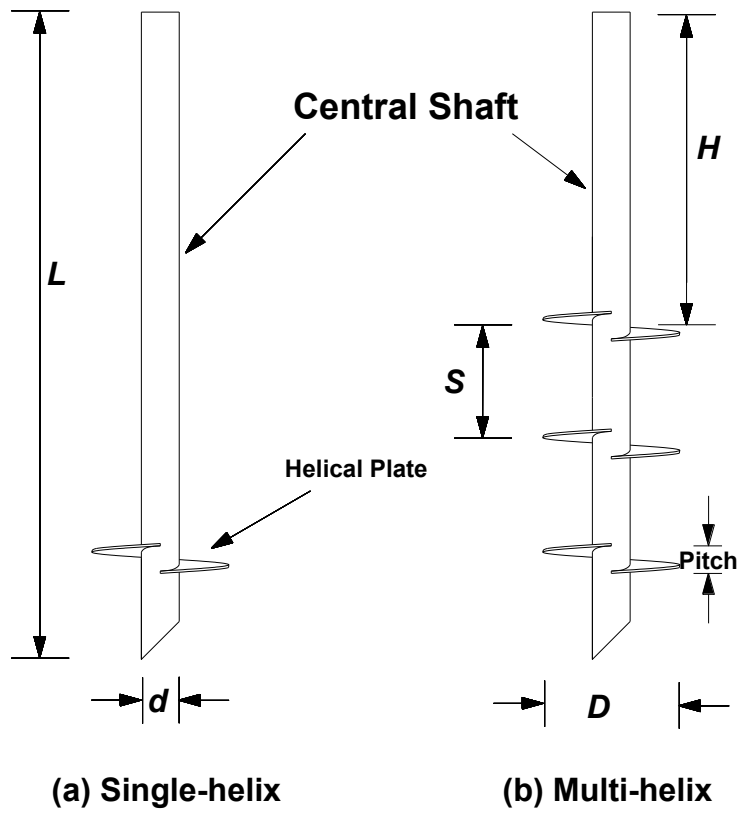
Sketch of typical helical piles: (a) single-helix piles, and (b) multi-helix piles
